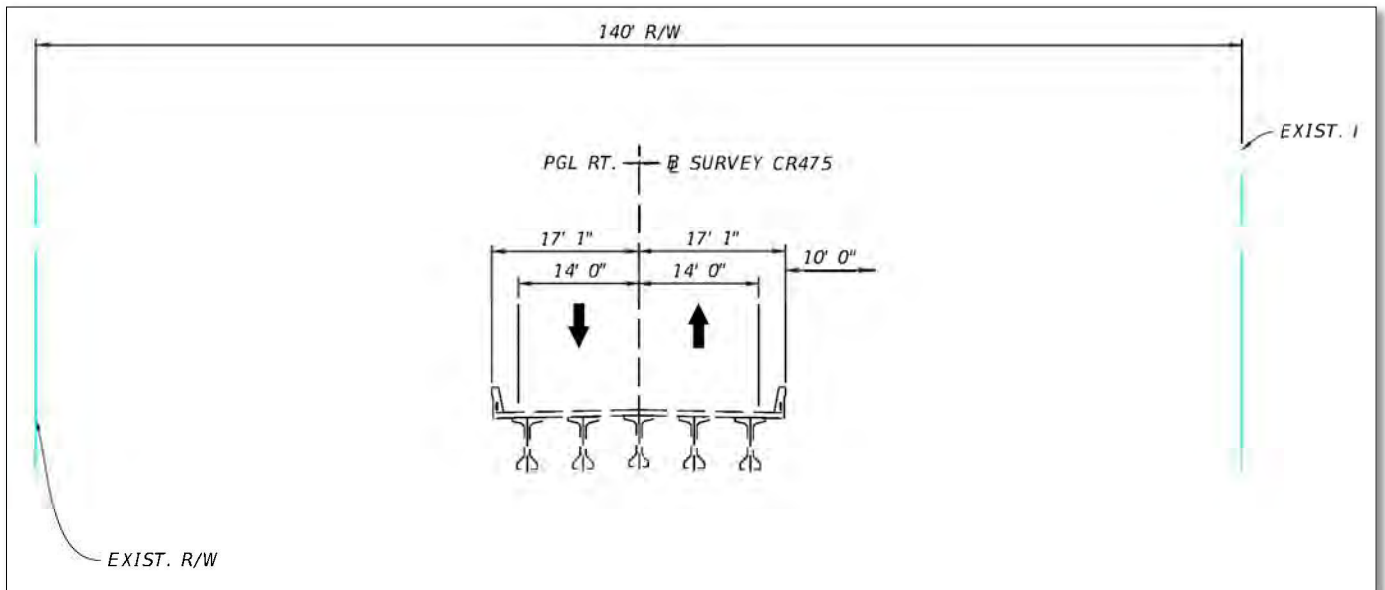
Existing Typical Section of C.R. 475 Bridge # 180048 (Over I-75)
